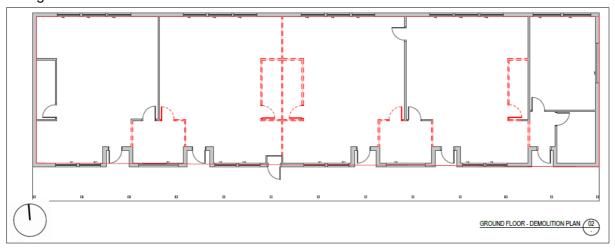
Proposed Demolition Plan (Source: Pedavoli Architects)
